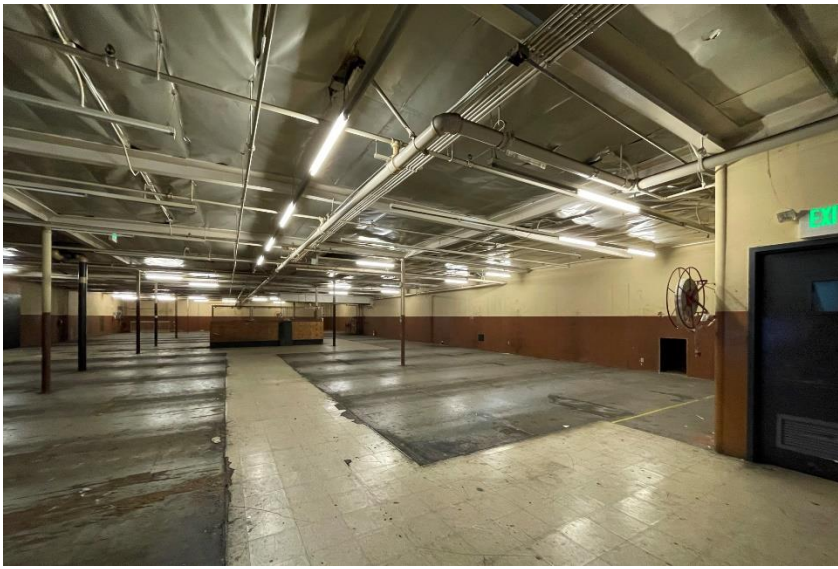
Miscellaneous items left in main auto shop floor space and open chute protruding from the ceiling.
